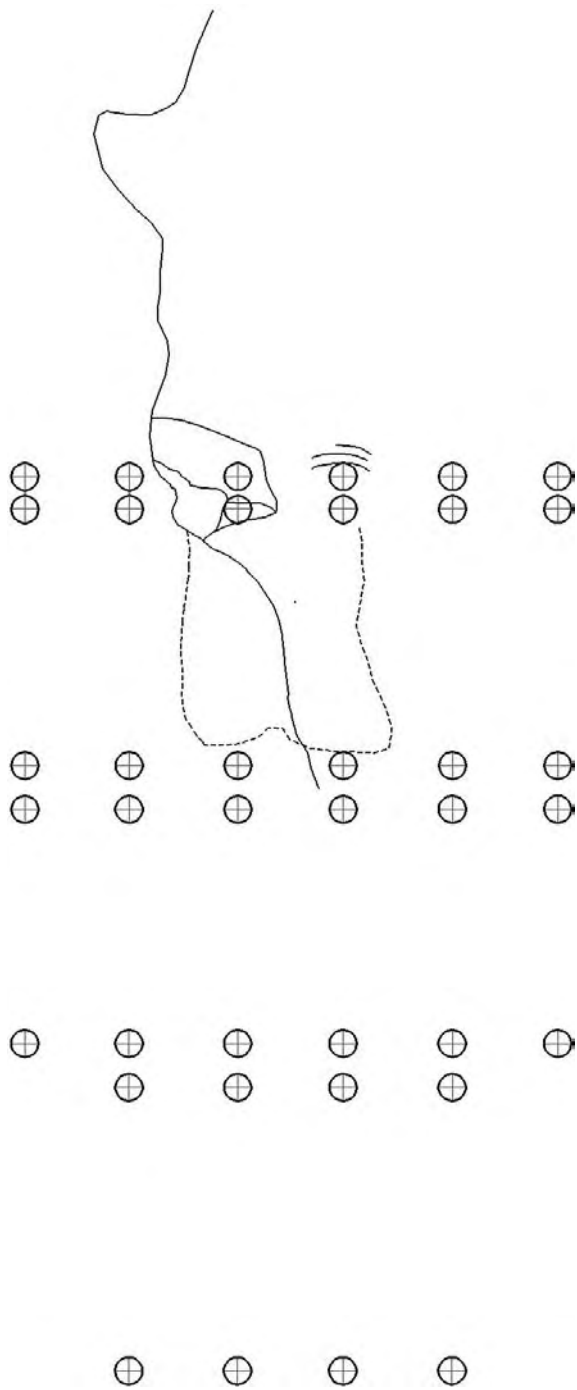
Spalling observations on June 2. Small chips and drummy inside spalled line.
